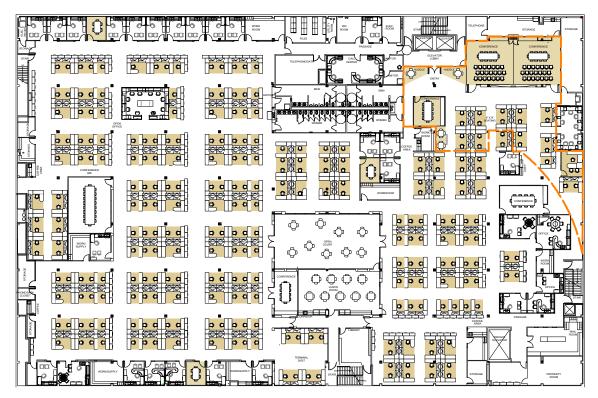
Test fit plan, Eastmont Town Center (6955 Foothill Ave), Floor 3
